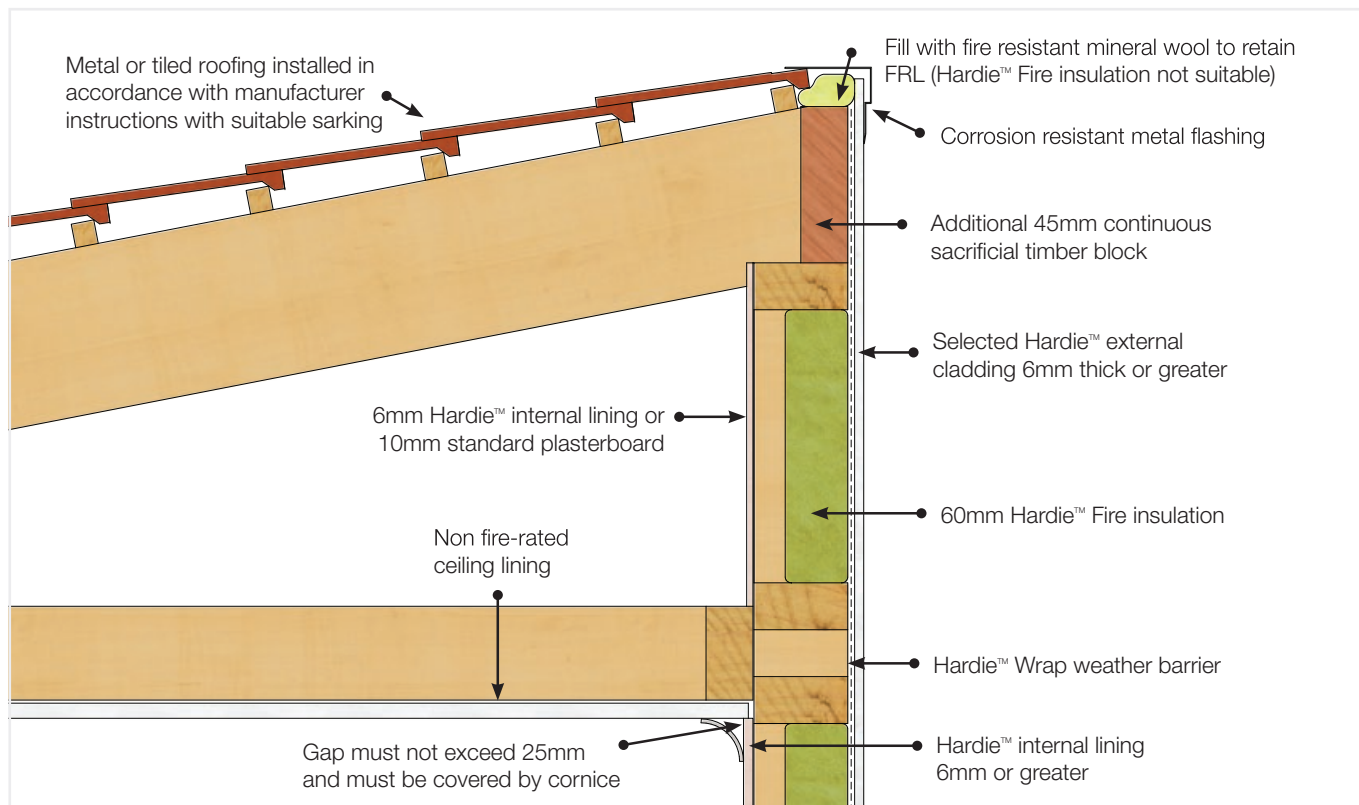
EXTERNAL BOUNDARY WALL TO PARAPET FRAMED ROOF
